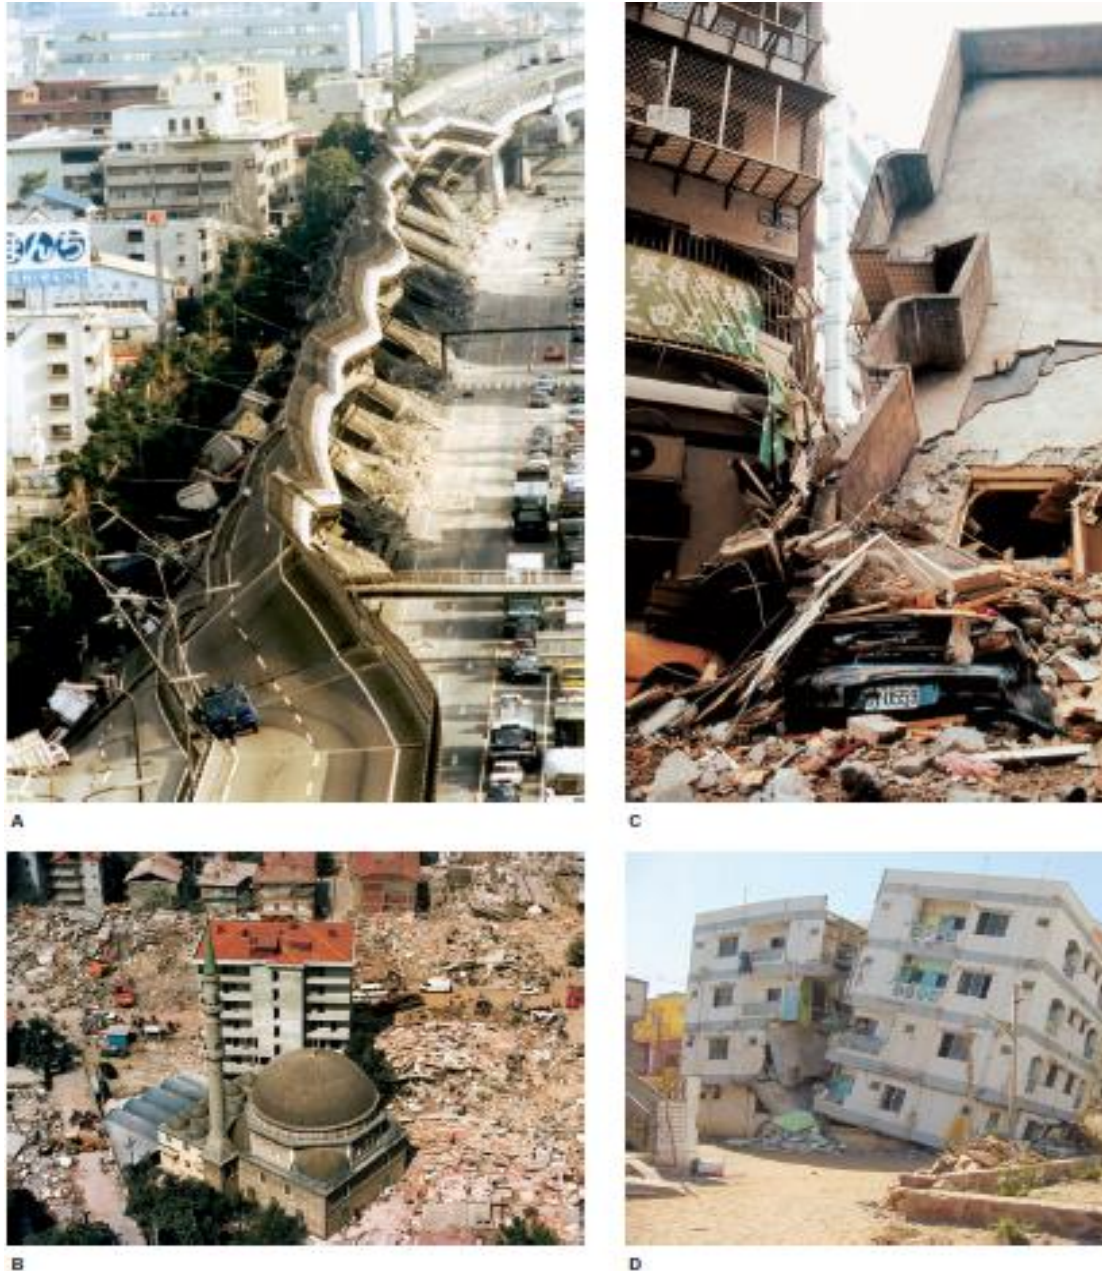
Earthquake damage to structures from recent major earthquakes throughout the world. (A) Elevated highway knocked over by a strong horizontal jolt during the 1995 Kobe, Japan, earthquake. Damage exceeded \$400 billion and destroyed or severely damaged more than 88,000 buildings. (B) Poorly constructed buildings crumbled during the 1999 Izmit, Turkey, earthquake, while structures built to seismic code and old mosques were left standing. (C) Many high-rise buildings collapsed during the 1999 Taiwan earthquake. The M-7.6 quake was the largest to hit central Taiwan in the past 400 years, and damage exceeded \$14 billion. (D) One of the many buildings damaged during the January 2001 Gujarat, India, earthquake that caused over \$1.3 billion in damage. *Photo A* © Reuter/Sankei/Shimbun; *photo B* © AP/Wide World Photo; *photo C* © Smith Glenn/SYGMA Corbis; *photo D* © Jaswant Arelekar/IITK, Kanpur, India
